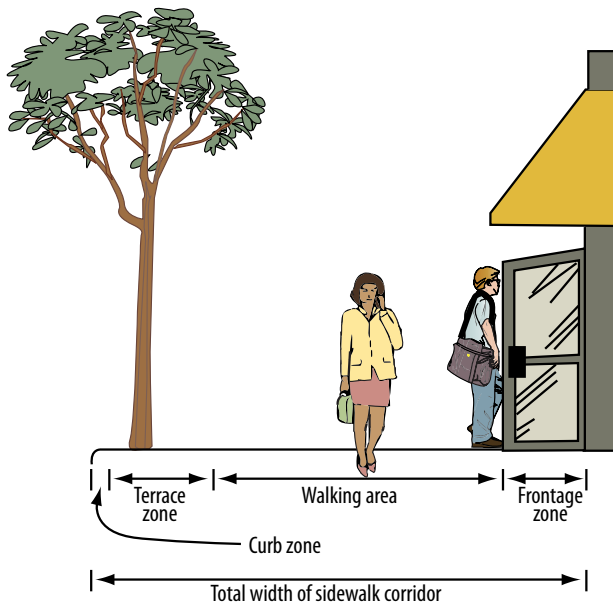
The four parts of a typical sidewalk corridor.
